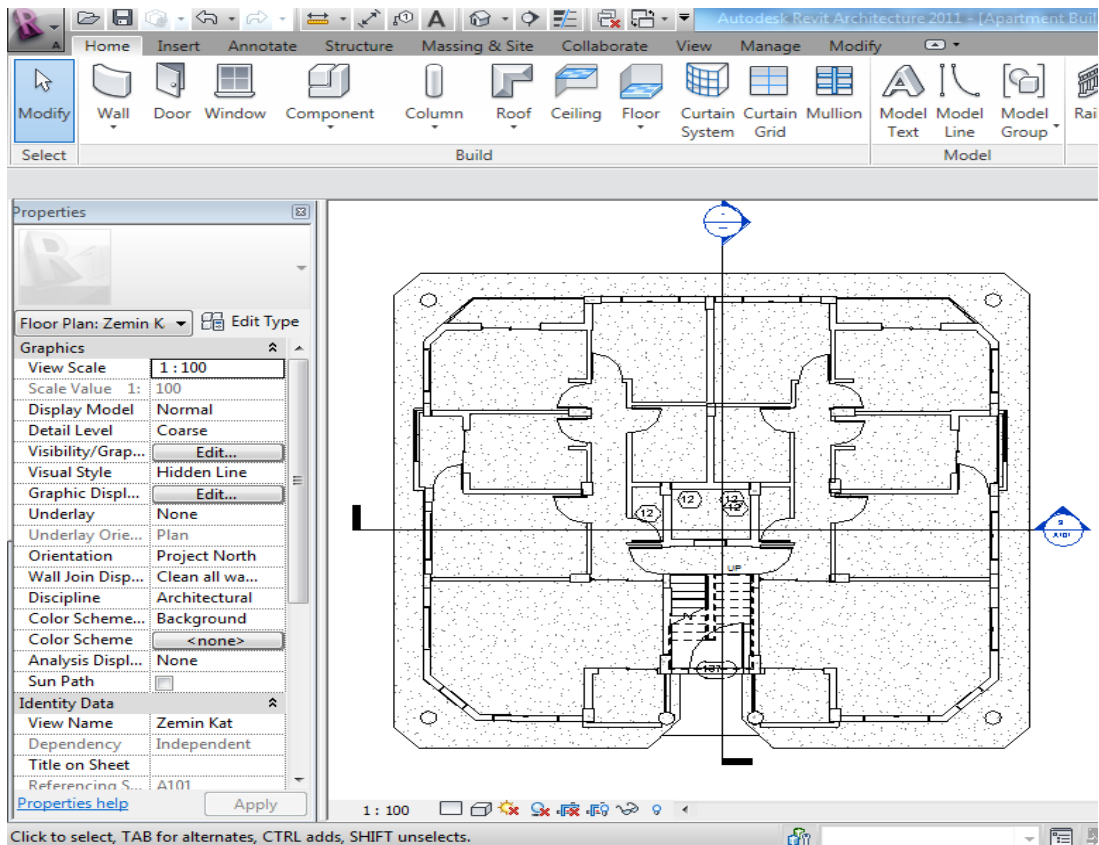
Ground floor plan of apartment building in Autodesk Revit Architecture
